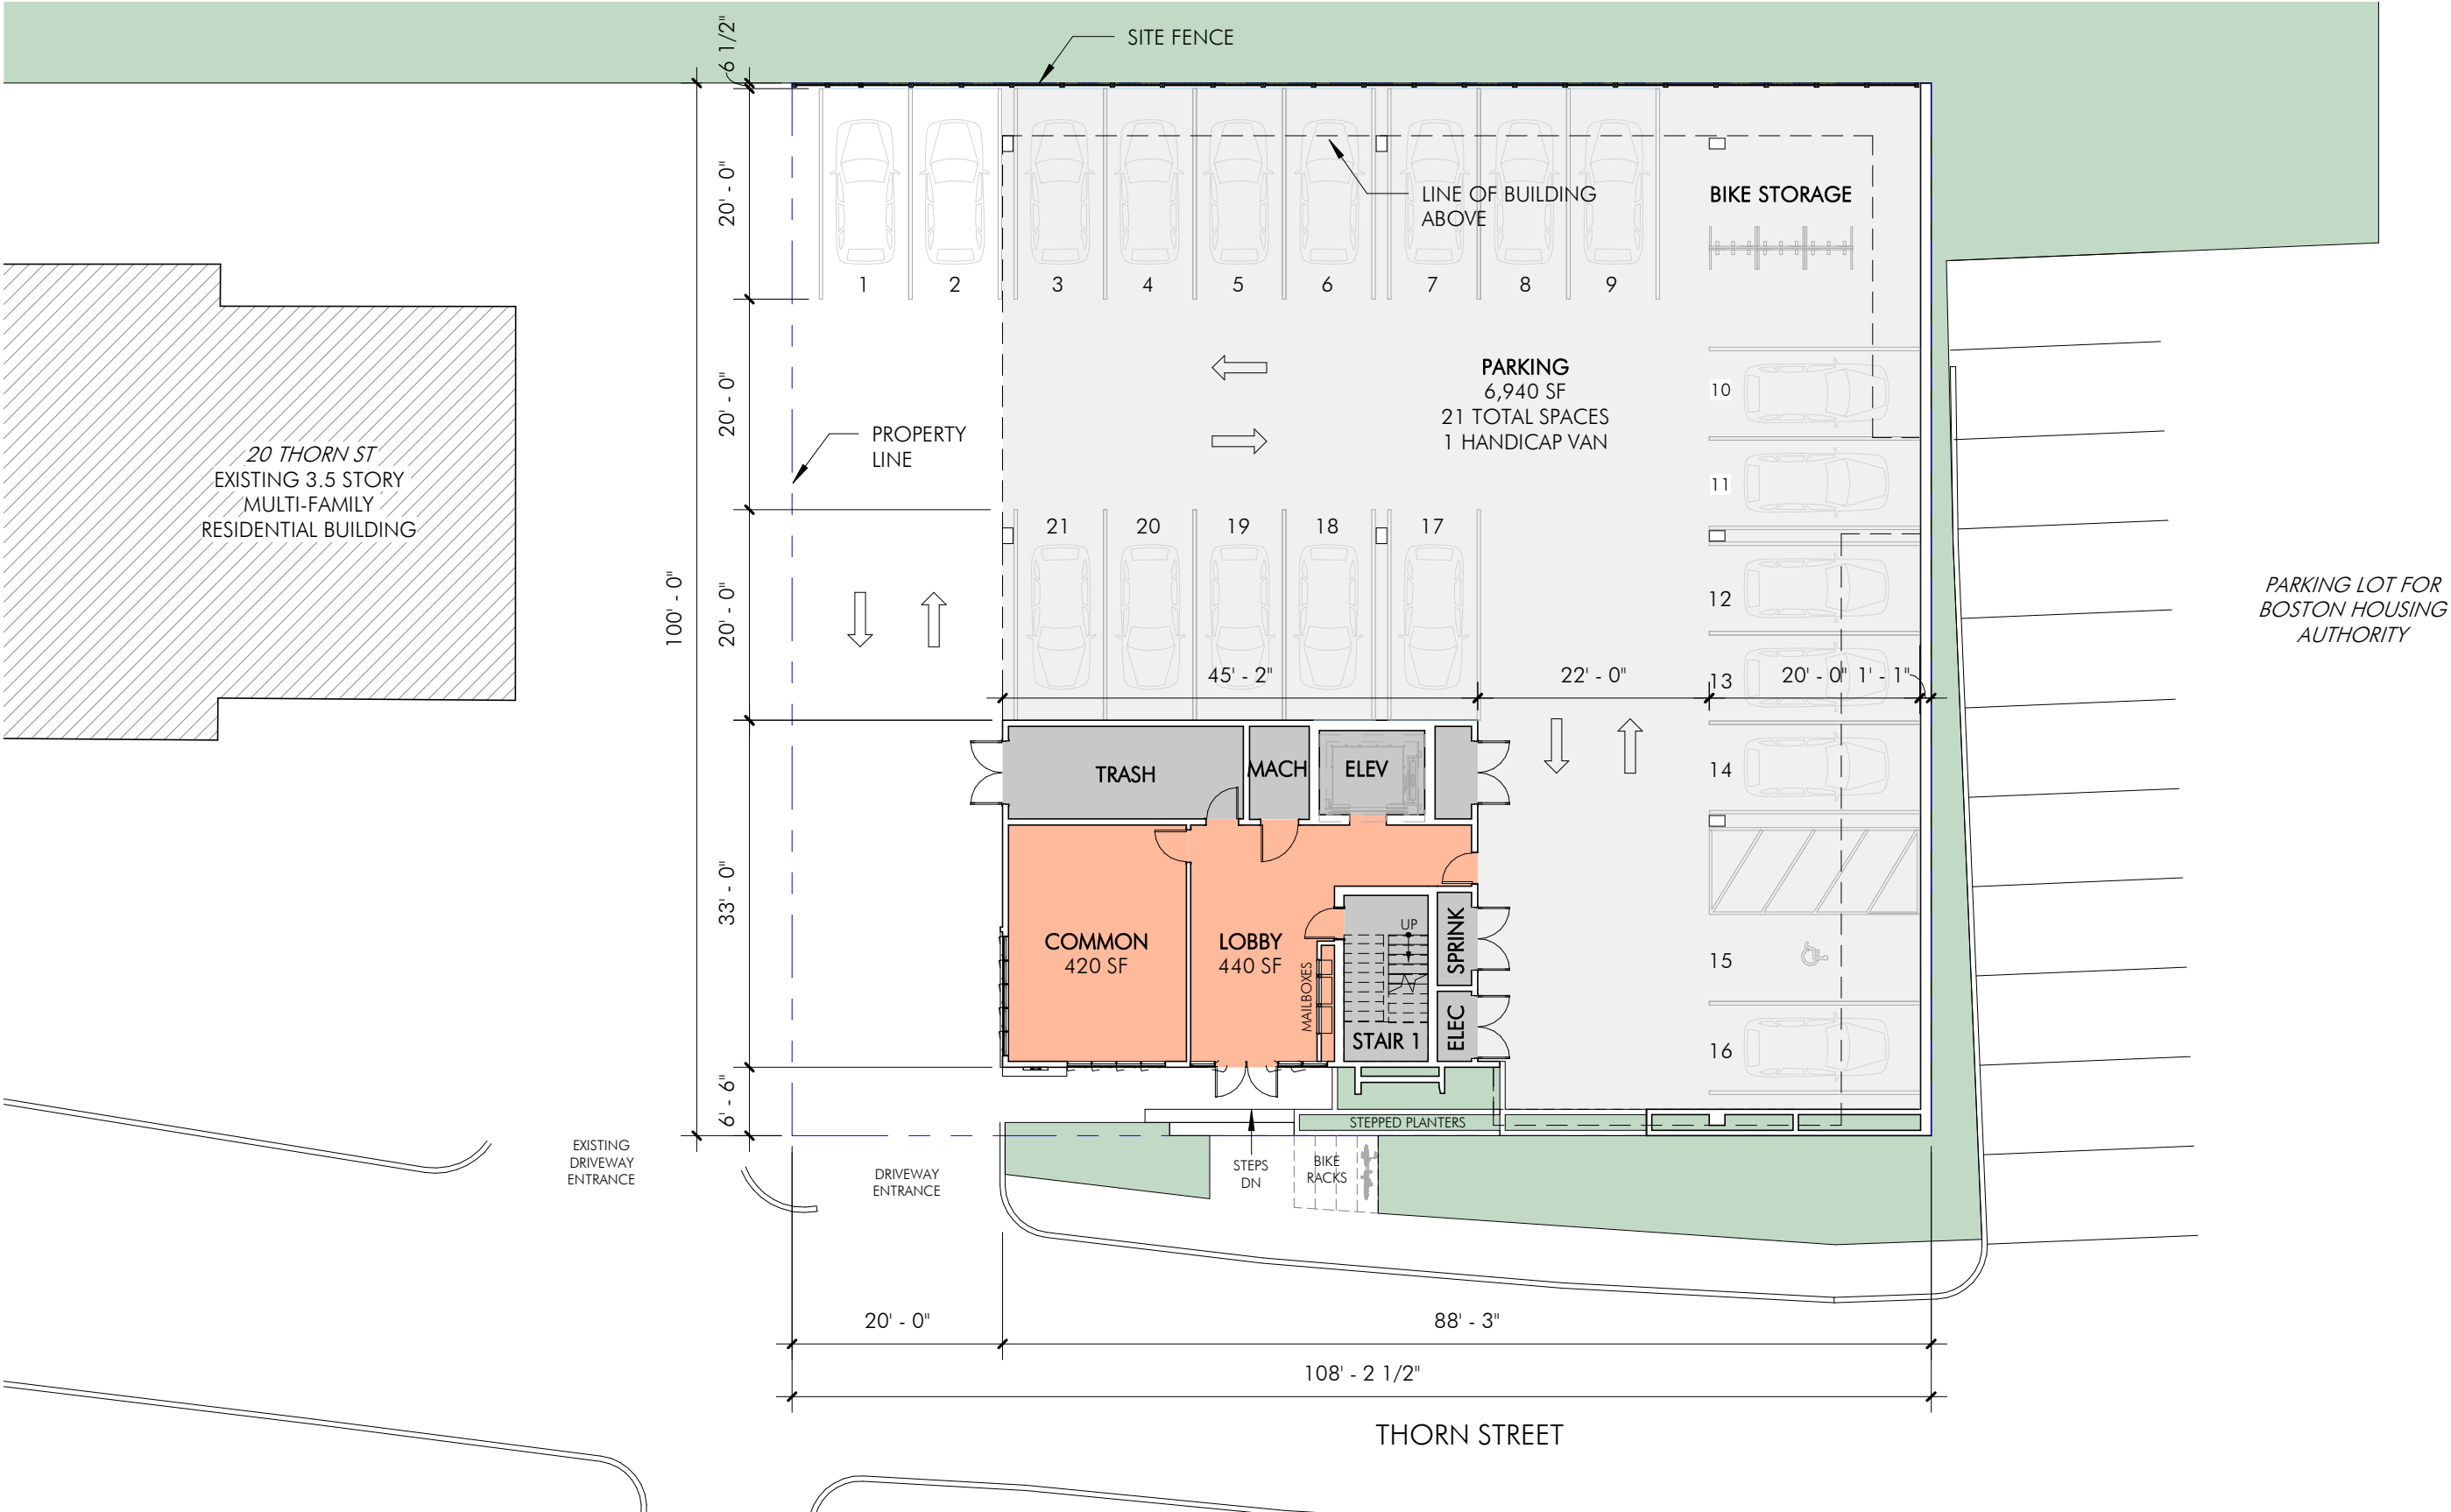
RESIDENTIAL FLOOR PLAN
